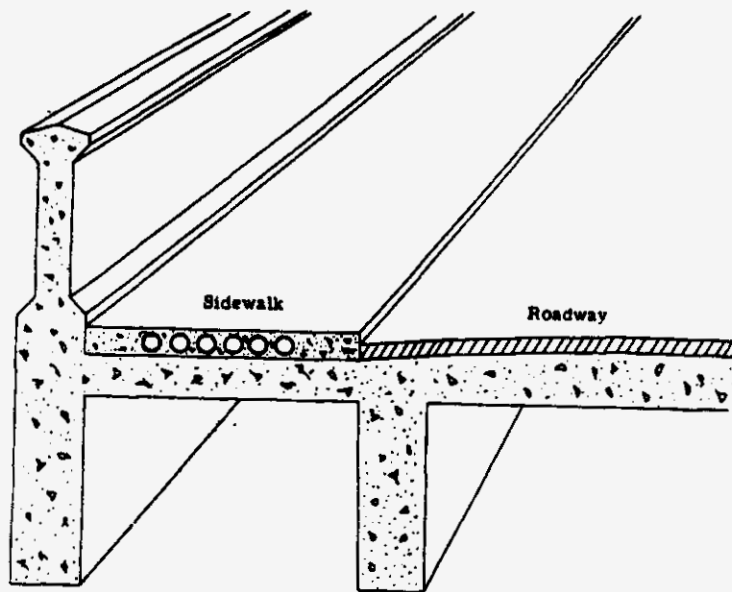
Conduit Installed in Sidewalk Portion of Bridge.
